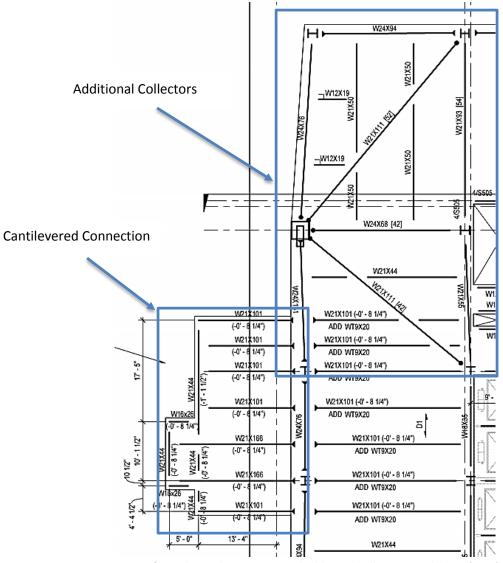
| Cantilevered Connection and Additional Collectors at 5th Floor (S105)
